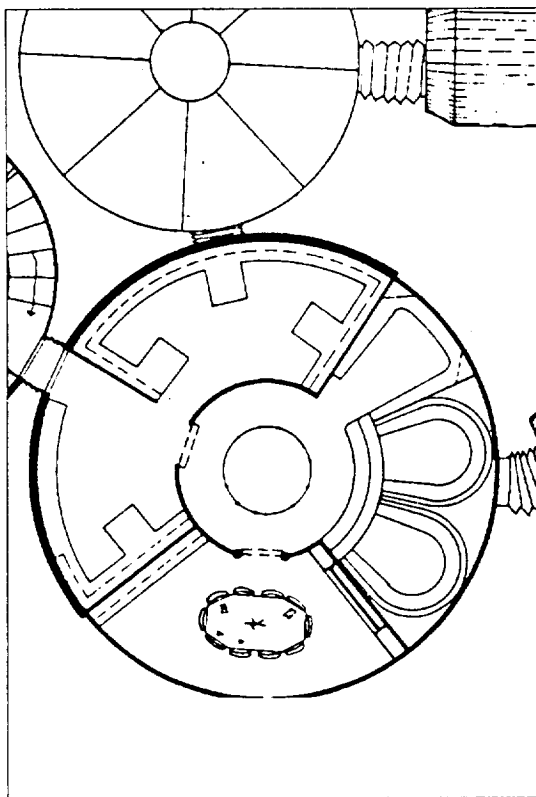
Floor plan of the upper level of the laboratory/mission operations module. The conference room and three mission control workstations are in the bottom segments of the plan.
